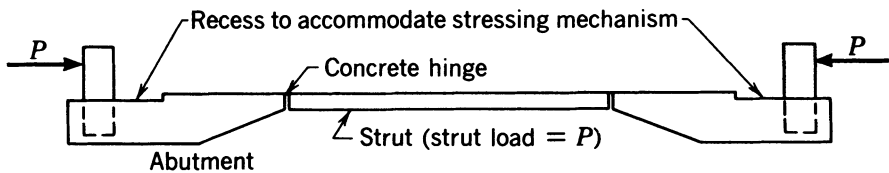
Elevation of abutment-and-strut pretensioning bench.
